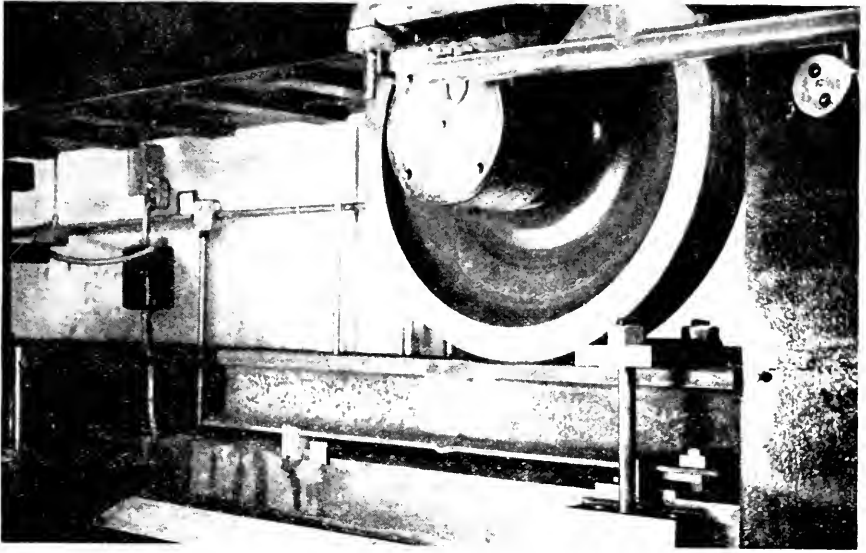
Welded Rail in 33-In. Rolling-Load Machine.
